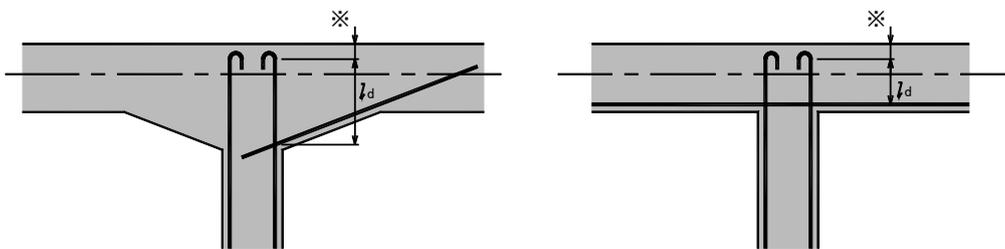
Anchorage of longitudinal reinforcement in middle layer beam<sup>1)</sup>
